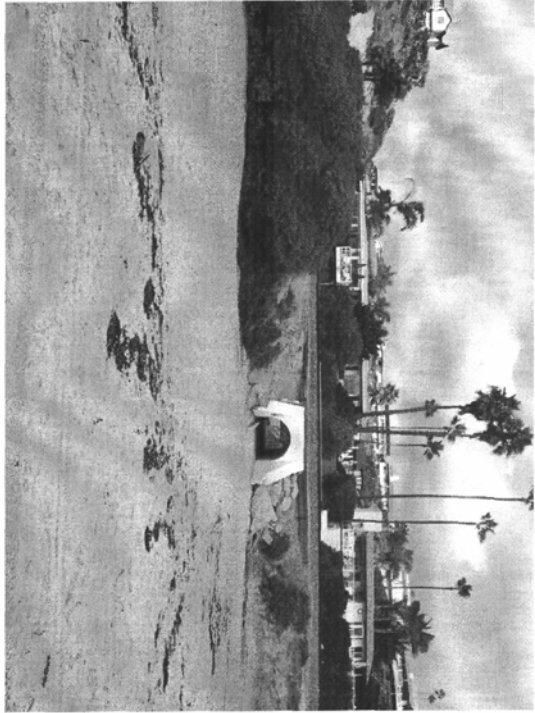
Culvert under Rail road. On Riviera Beach at highest point on beach berm, looking east toward the Riviera access and project location.
